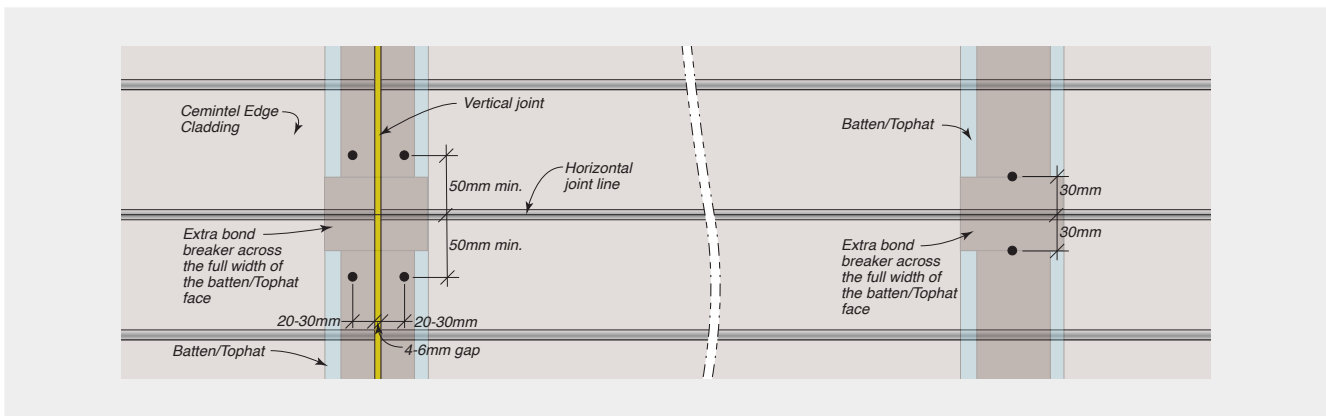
NEW: Cavity fix connection layout to framing
